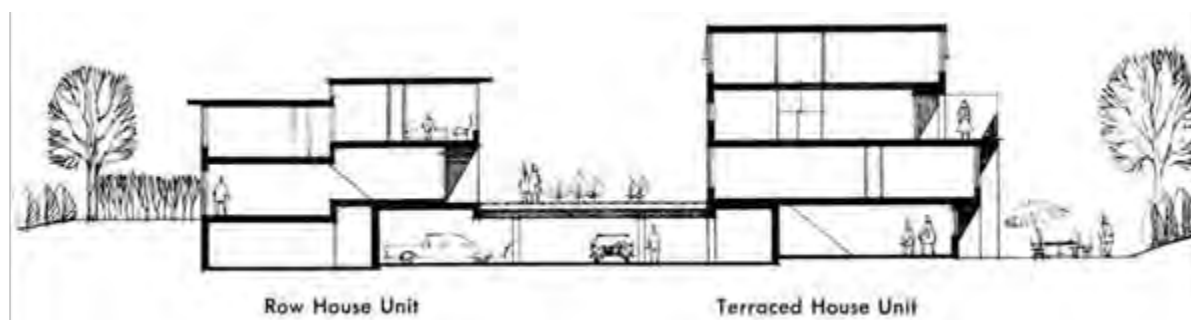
Section through street at R-1 Unit, left and T-2/T-1 Unit, right (Source: Grossman 1961:64).
